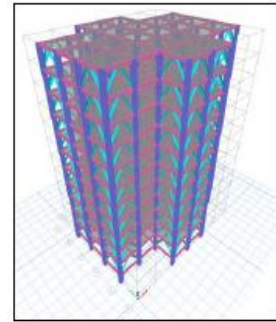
3D View of Plus Shaped building with Inverted V Bracing
